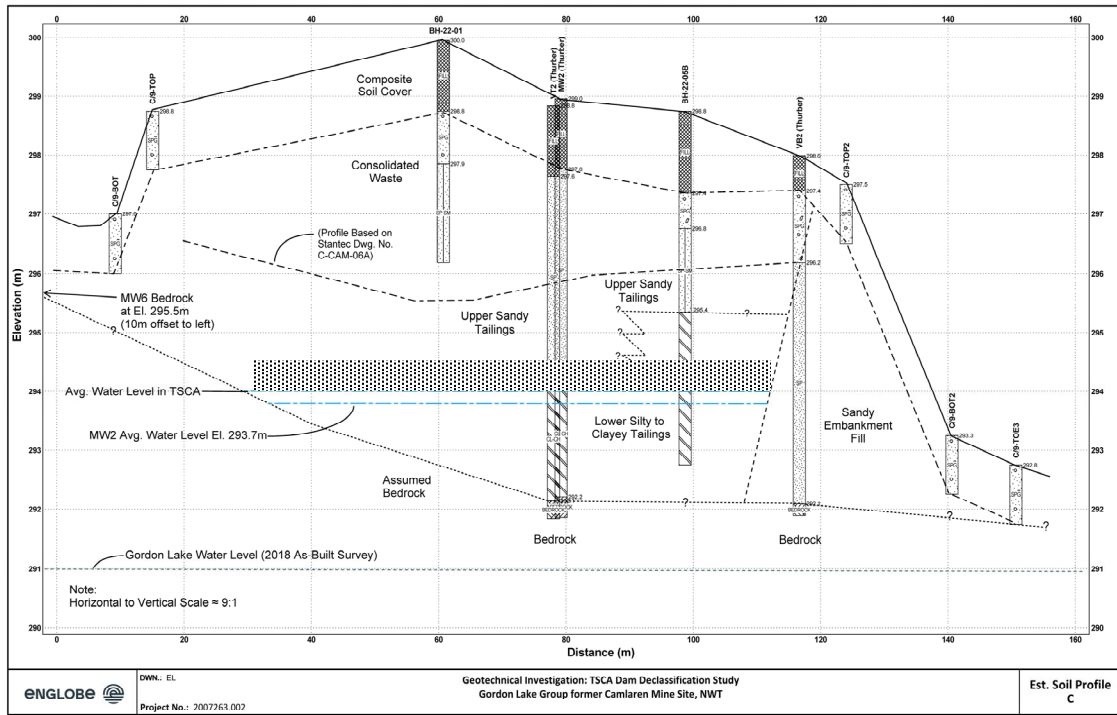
Cross Section View Showing Cross Section C Boring Locations and the Potential Liquefiable Zone Based on Robertson 2021
